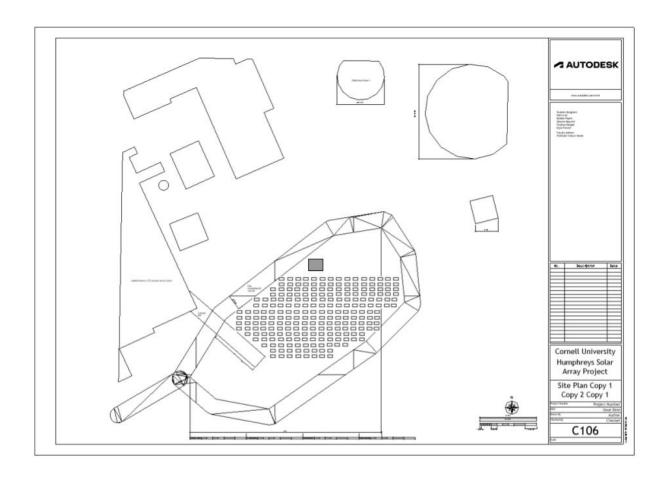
Revit of Proposed Solar Array Layout: Single-Mounted– panels close to Conveyer belt
